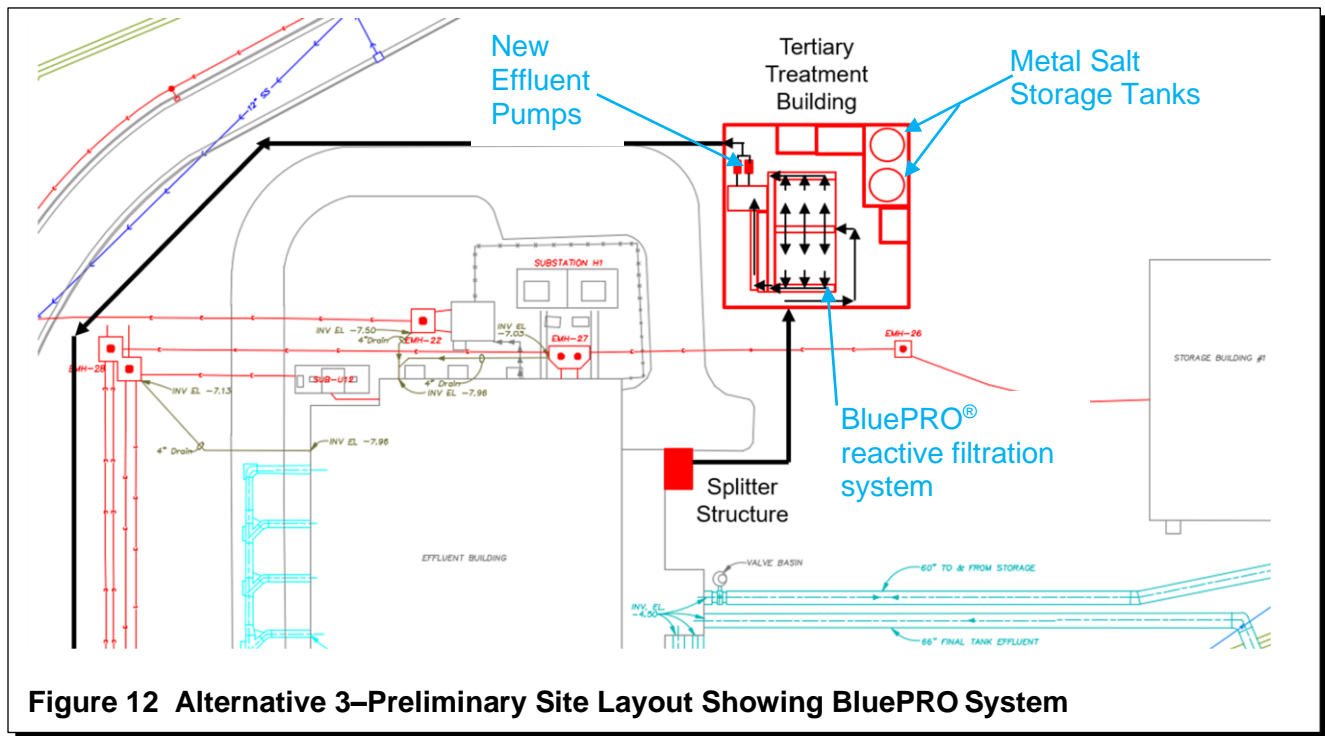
Alternative 3—Preliminary Site Layout Showing BluePRO System
